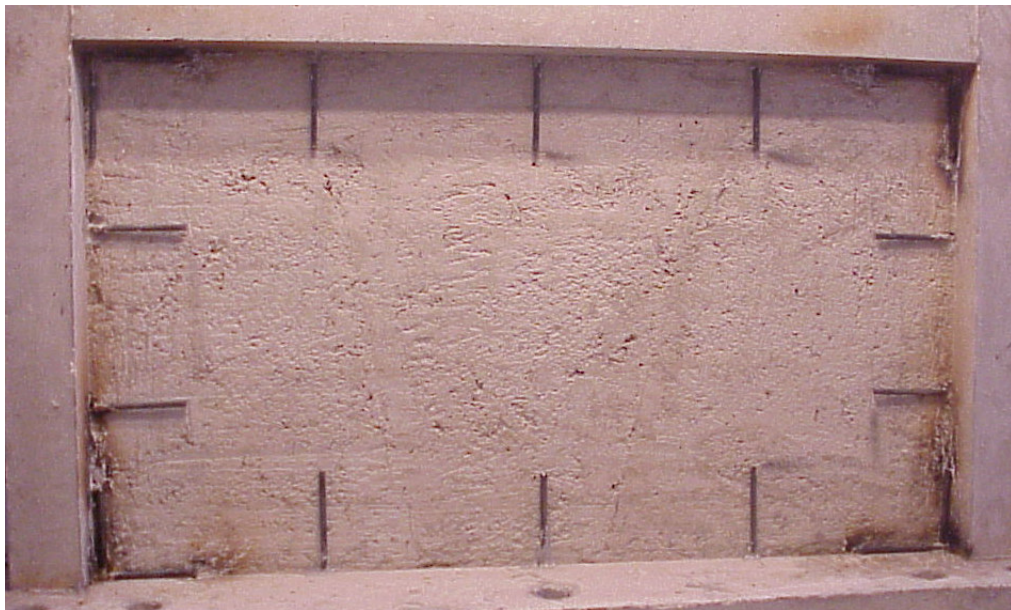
Anchorage bar arrangement for Specimen CIC4
